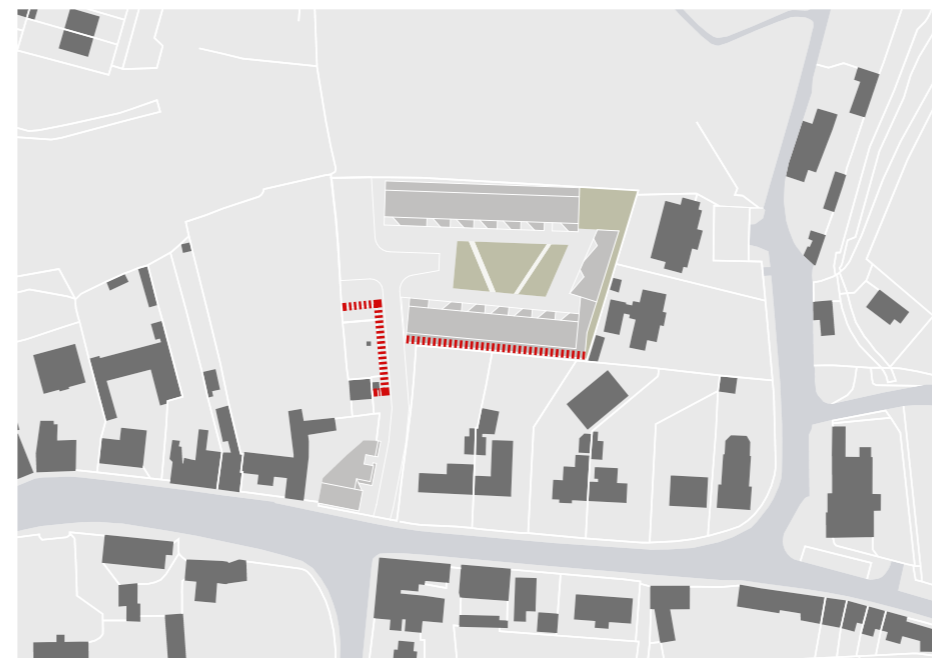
Green spaces are provided in the central garden and to the North-East corner of the site for the use of the residents. Screening measures are provided around the ESB mast enclosure and on the Southern residential block to avoid overlooking issues towards the adjoining residential properties.
